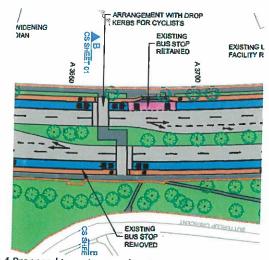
Proposed two-stage pedestrian crossing near Belcamp Lane
